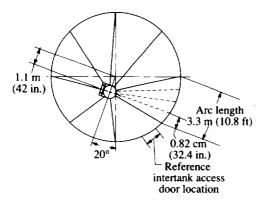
First floor of lunar habitat. Floor outside diameter, 8.4 m (27.5 ft); Total floor area minus Area of access opening, 54 m<sup>2</sup> (584 ft<sup>2</sup>).
